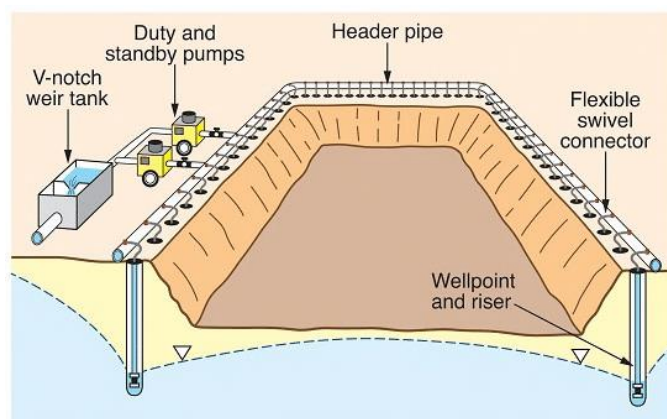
Wellpoint temporary dewatering for a shallow excavation. Retrieved from [23]
